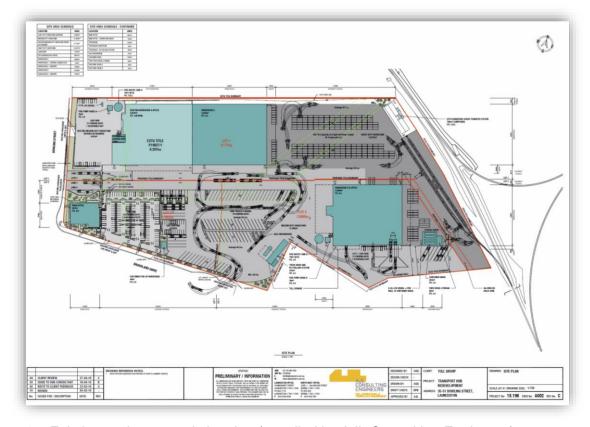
Existing and proposed site plan (supplied by AJL Consulting Engineers).
